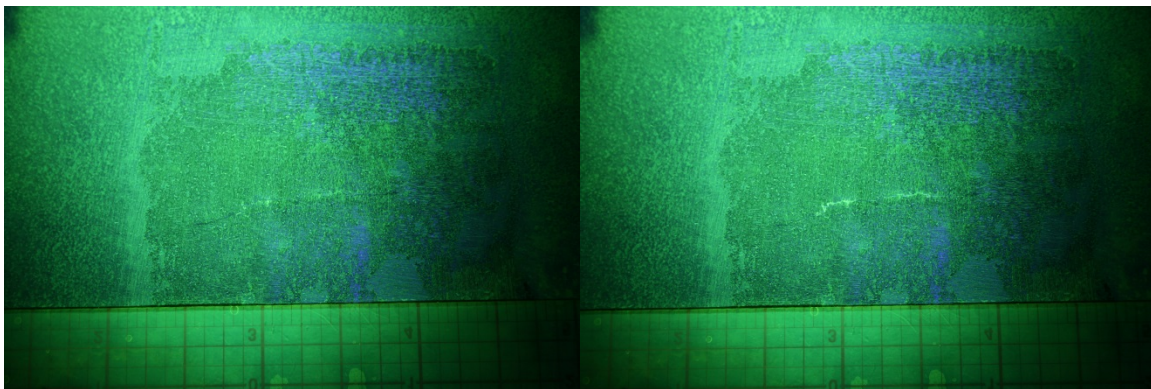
Penetrant testing used in the detection of distortion induced fatigue cracks in a steel girder under dynamic load.
